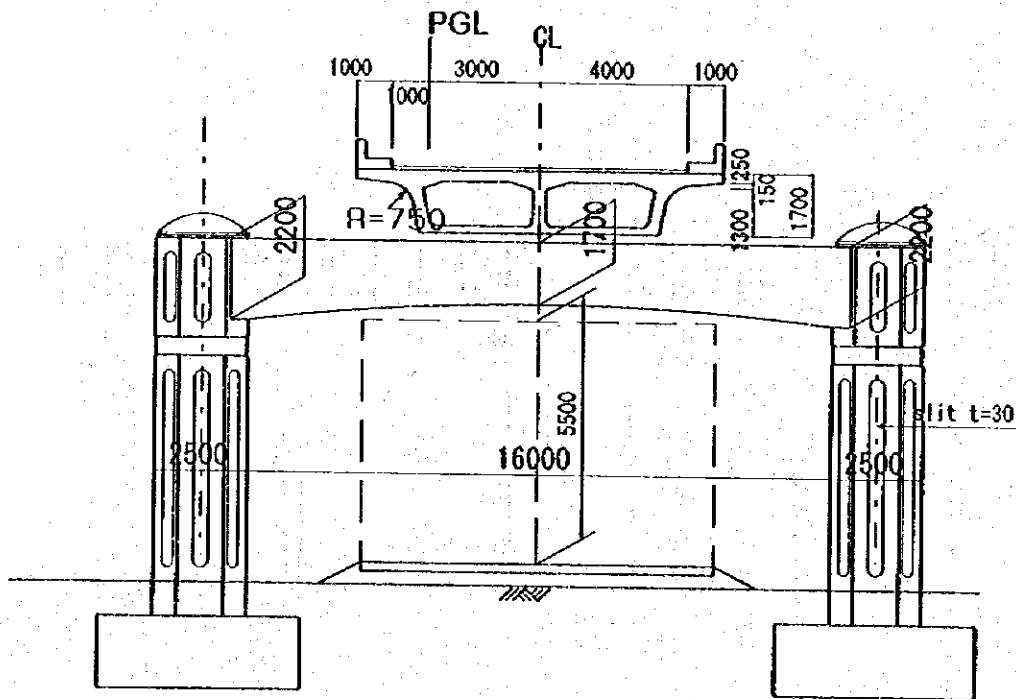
Cross-sectional Details of Super-structure Type-1 with Sub-Structure Type-5
